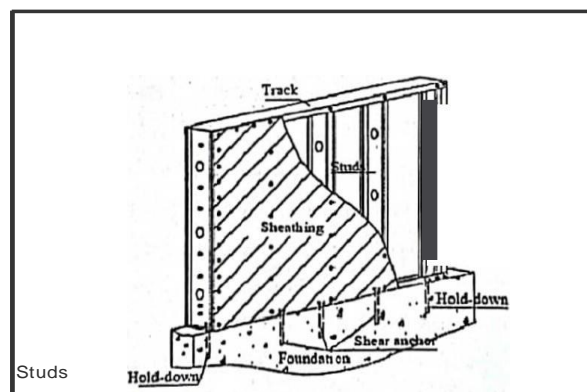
Typical Cold Formed Steel Shear Wall, Zhao and Rogers (2002)
